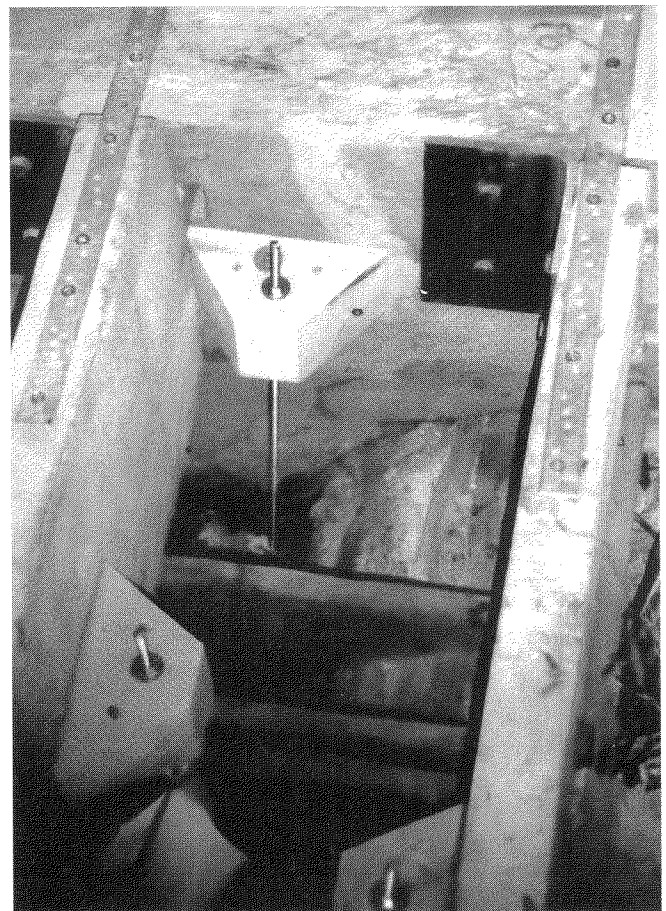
Junction of joists to tie beam showing straps and cleats added for extra rigidity. Also shown are the lugs through which structural ties, holding up plasterwork substructure, are secured and adjusted. Photo: Chris Daniels.
